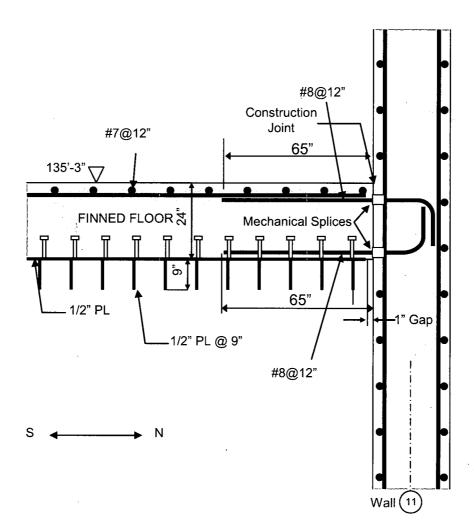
Auxiliary Building Finned Floor (Sheet 2 of 3)
